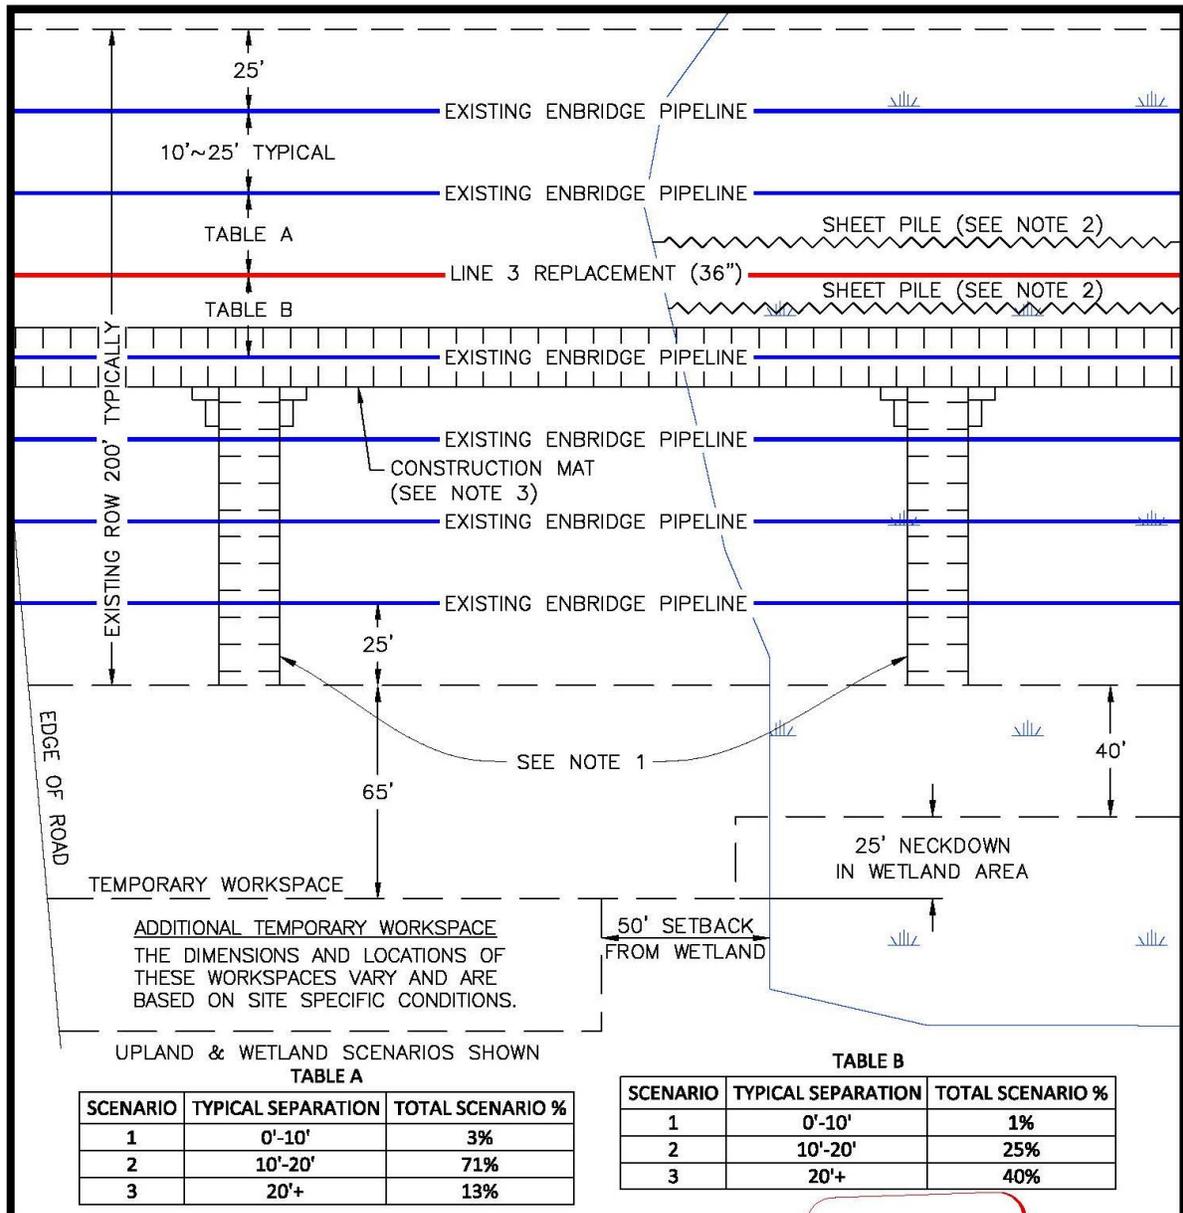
shows the typical construction footprint west of Clearbrook, where the construction work activities would be located on the south side of the Enbridge Mainline right-of-way. The land requirements would be as follows: Uplands: 265 feet in total, using 200 feet of existing permanent right-of-way and 65 of temporary workspace area; and Wetlands: 240 feet in total, using 200 feet of existing permanent right-of-way and 40 feet of temporary workspace area. (See Appendix I.2.)
